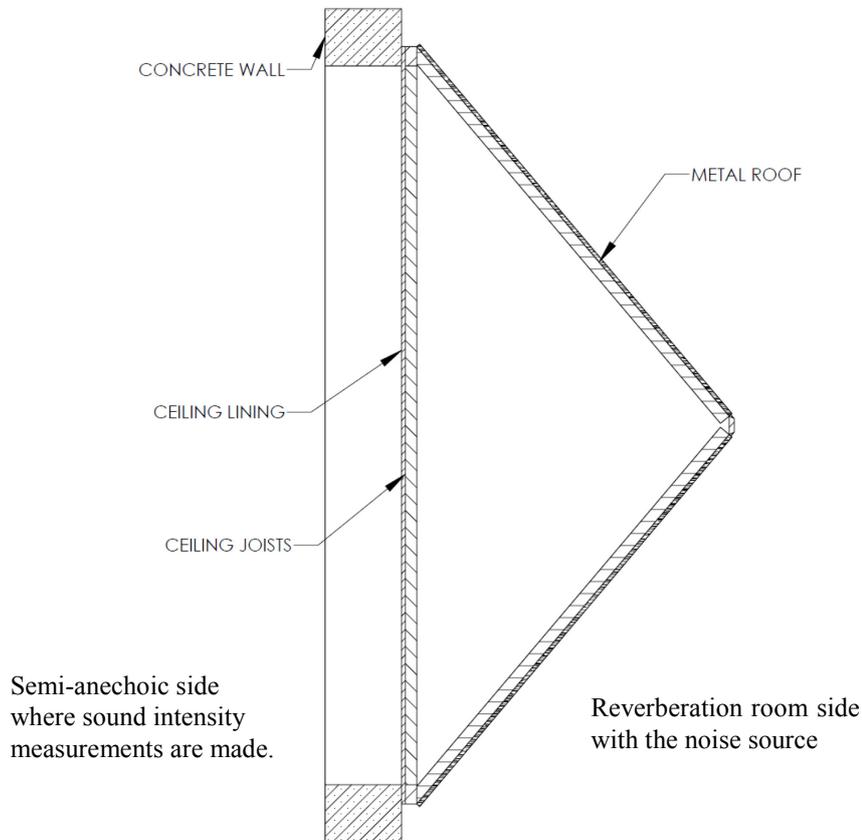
Simplified cross section of test roof system mounted to the concrete wall of the reverberation room. The trusses of the roof are not shown.
